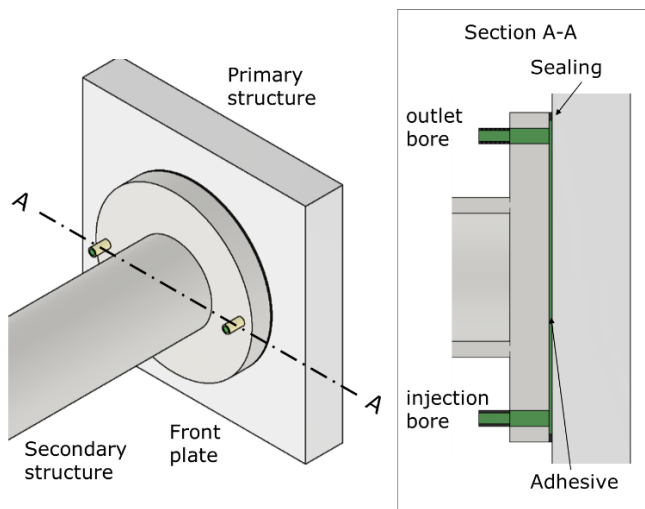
Construction detail and manufacturing concept of adhesively bonded secondary steel component
